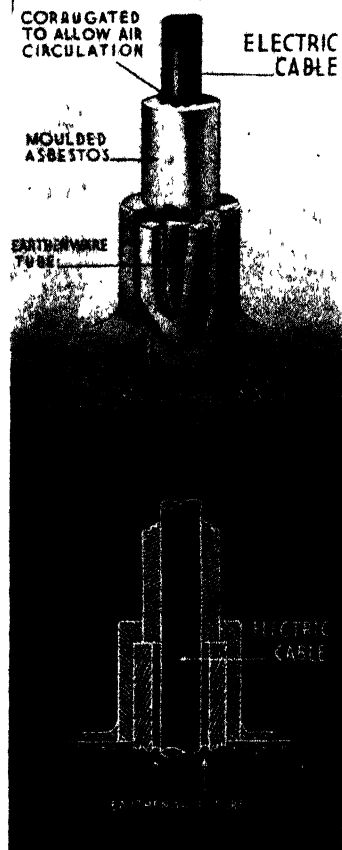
CONSTRUCTIONAL DETAILS OF FLOOR SEALING.
